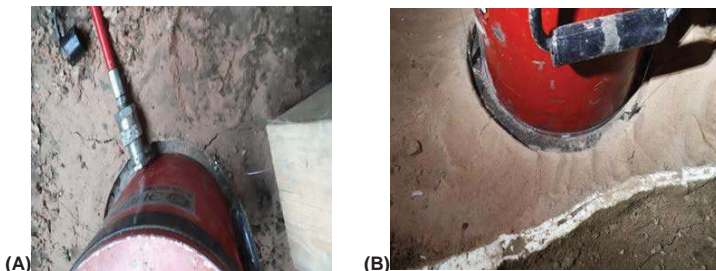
The soil under the ultimate load and cracks shown as a sign of the soil failure.
